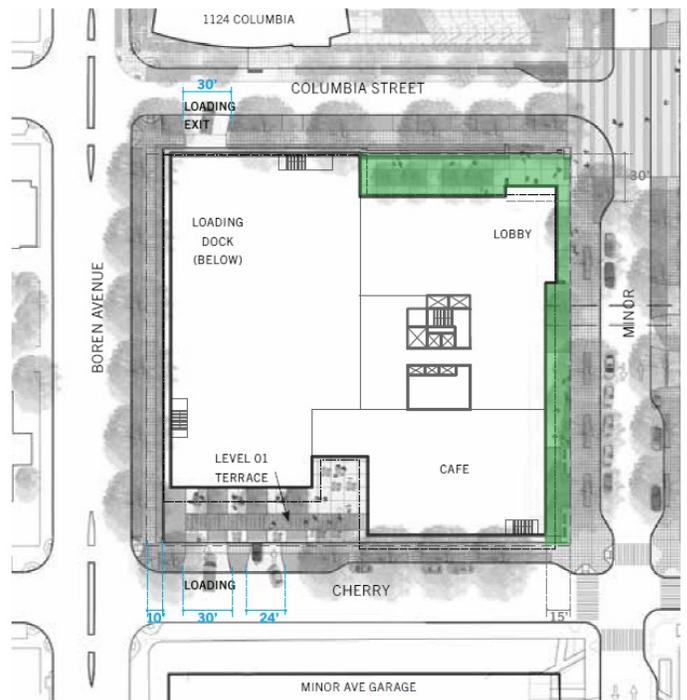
Proposed Open Space along Columbia St. and Minor Ave.
